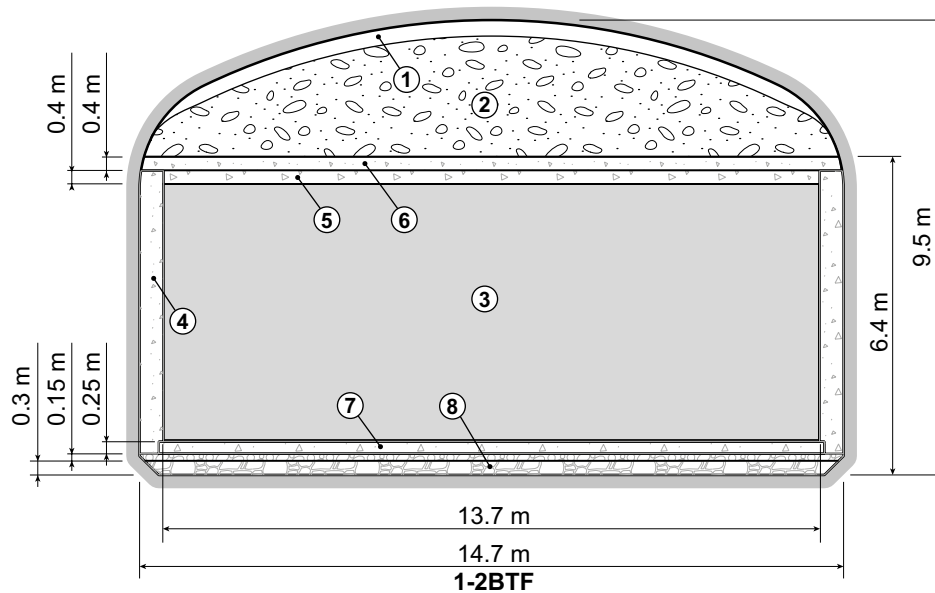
Schematic cross-section of 1BTf and 2BTf at closure. Key to numbering: 1) Void 2) Macadam backfill 3) Waste domain 4) Cementitious backfill 5) Pre-fabricated concrete elements 6) Cast concrete lid 7) Slab 8) Crushed rock (0.3 + 0.15 m).
